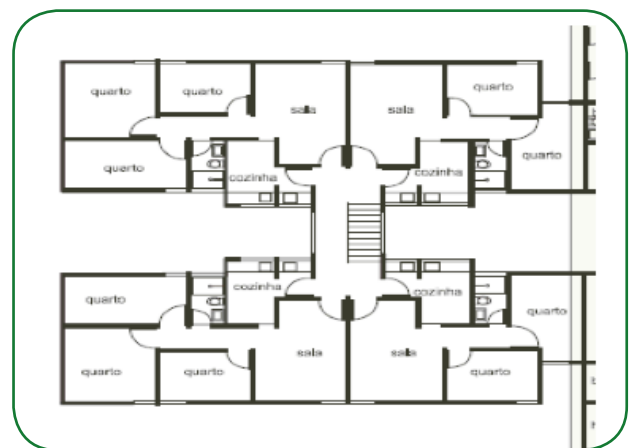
Typical floor of a multifamily building. Each building has 4 floors and 16 flats.
